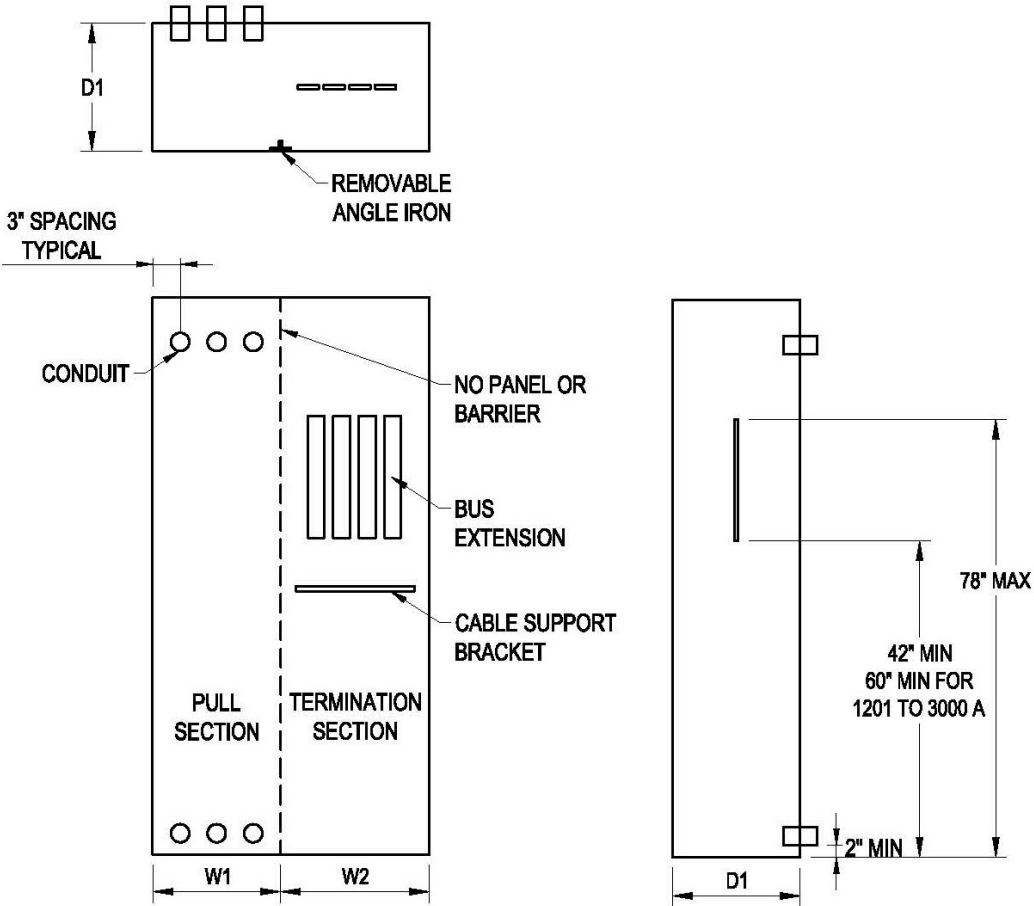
Underground Service Termination in a Pull Section Below Ground Level, Showing Pull Section with Back-Entry Conduits at the Top or Bottom (STD-D-6262)
